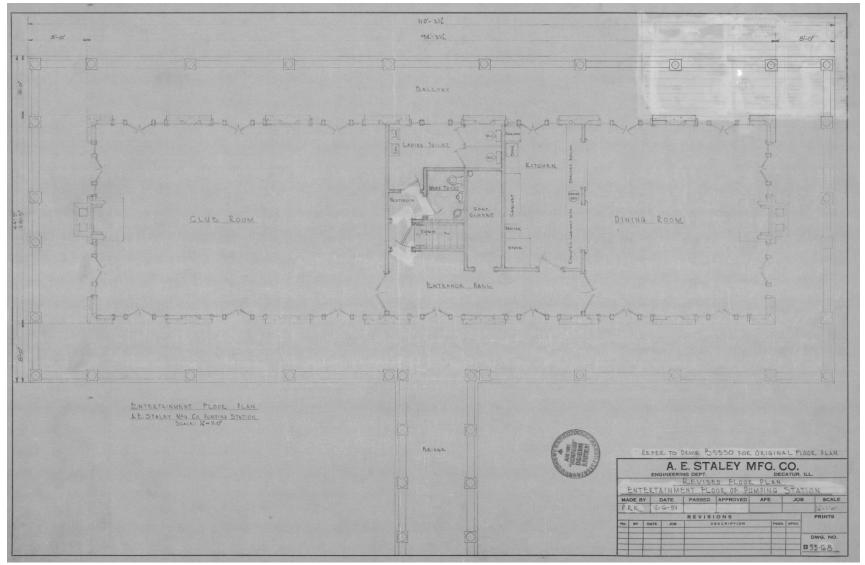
Revised Floor Plan; Entertainment Floor of Pumping Station (AES, Drawing No. 5368; 6 February 1951). These plans document the relocation of the men's toilet room from the Pump Level to the Club House or Entertainment Level.
